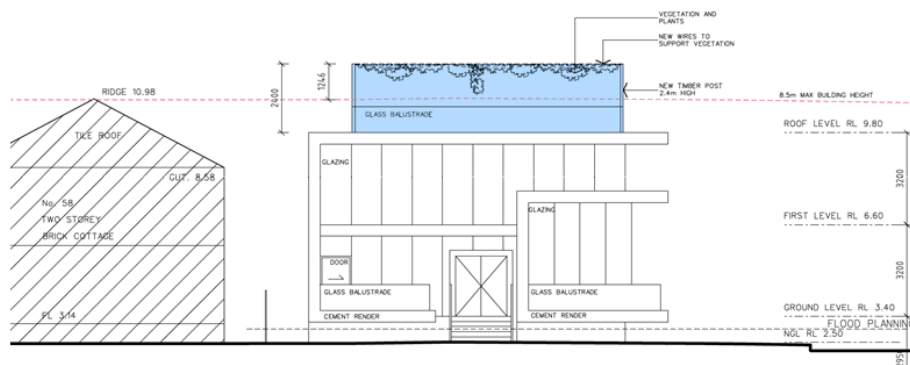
Proposed North Elevation illustrating the extent of timber posts situated above the LEPs maximum building height limit.
